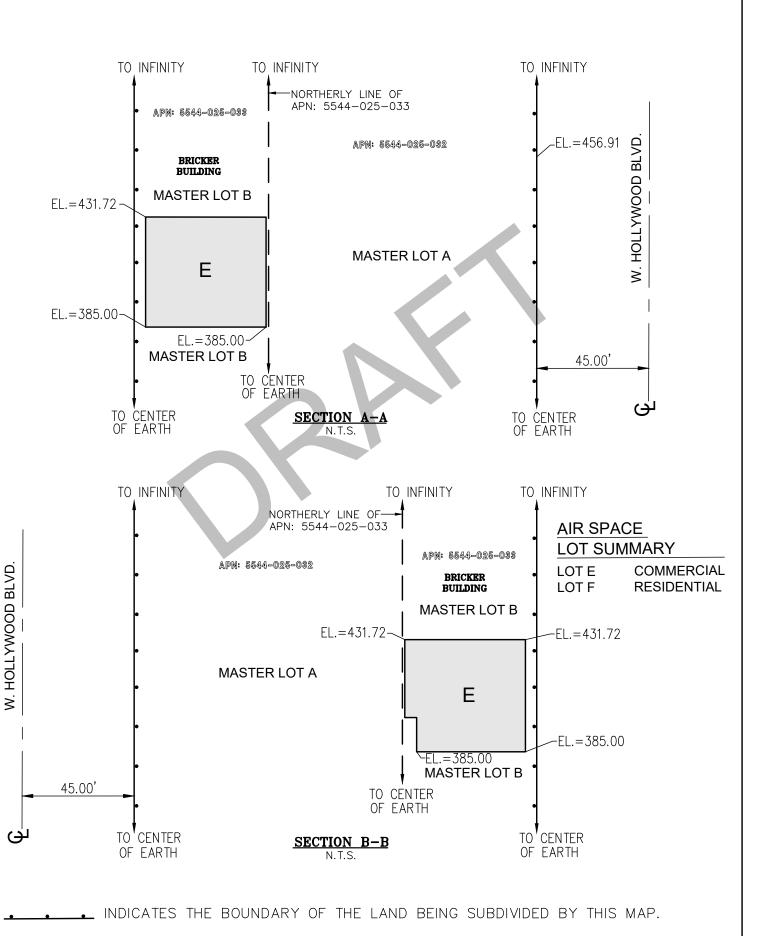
# EXHIBIT MASTER LOT <u>B - SECTION VIEW</u>
